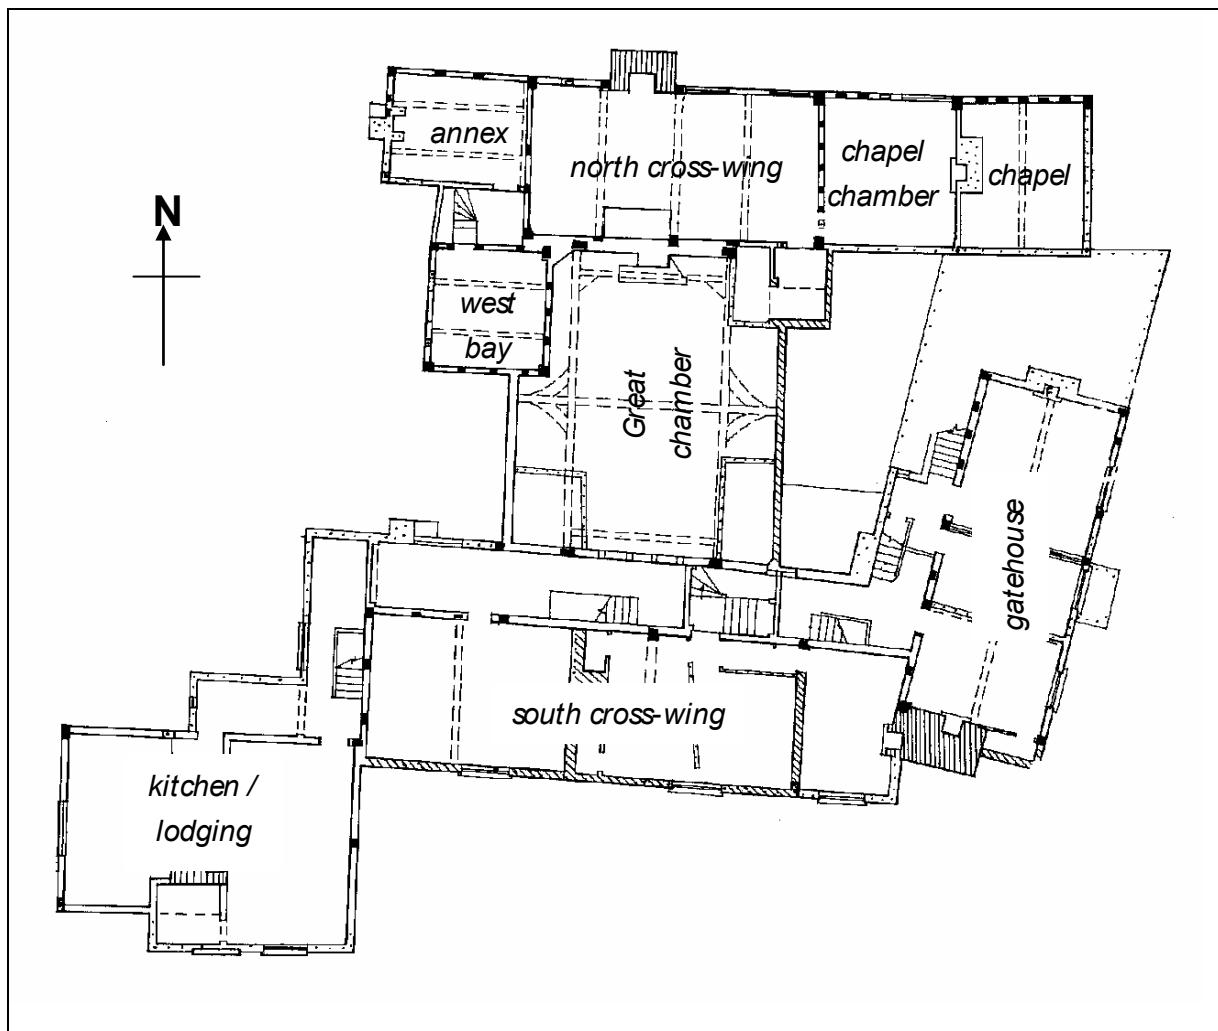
Plan at first-floor level to show layout of building (after Jones 1975–76)
